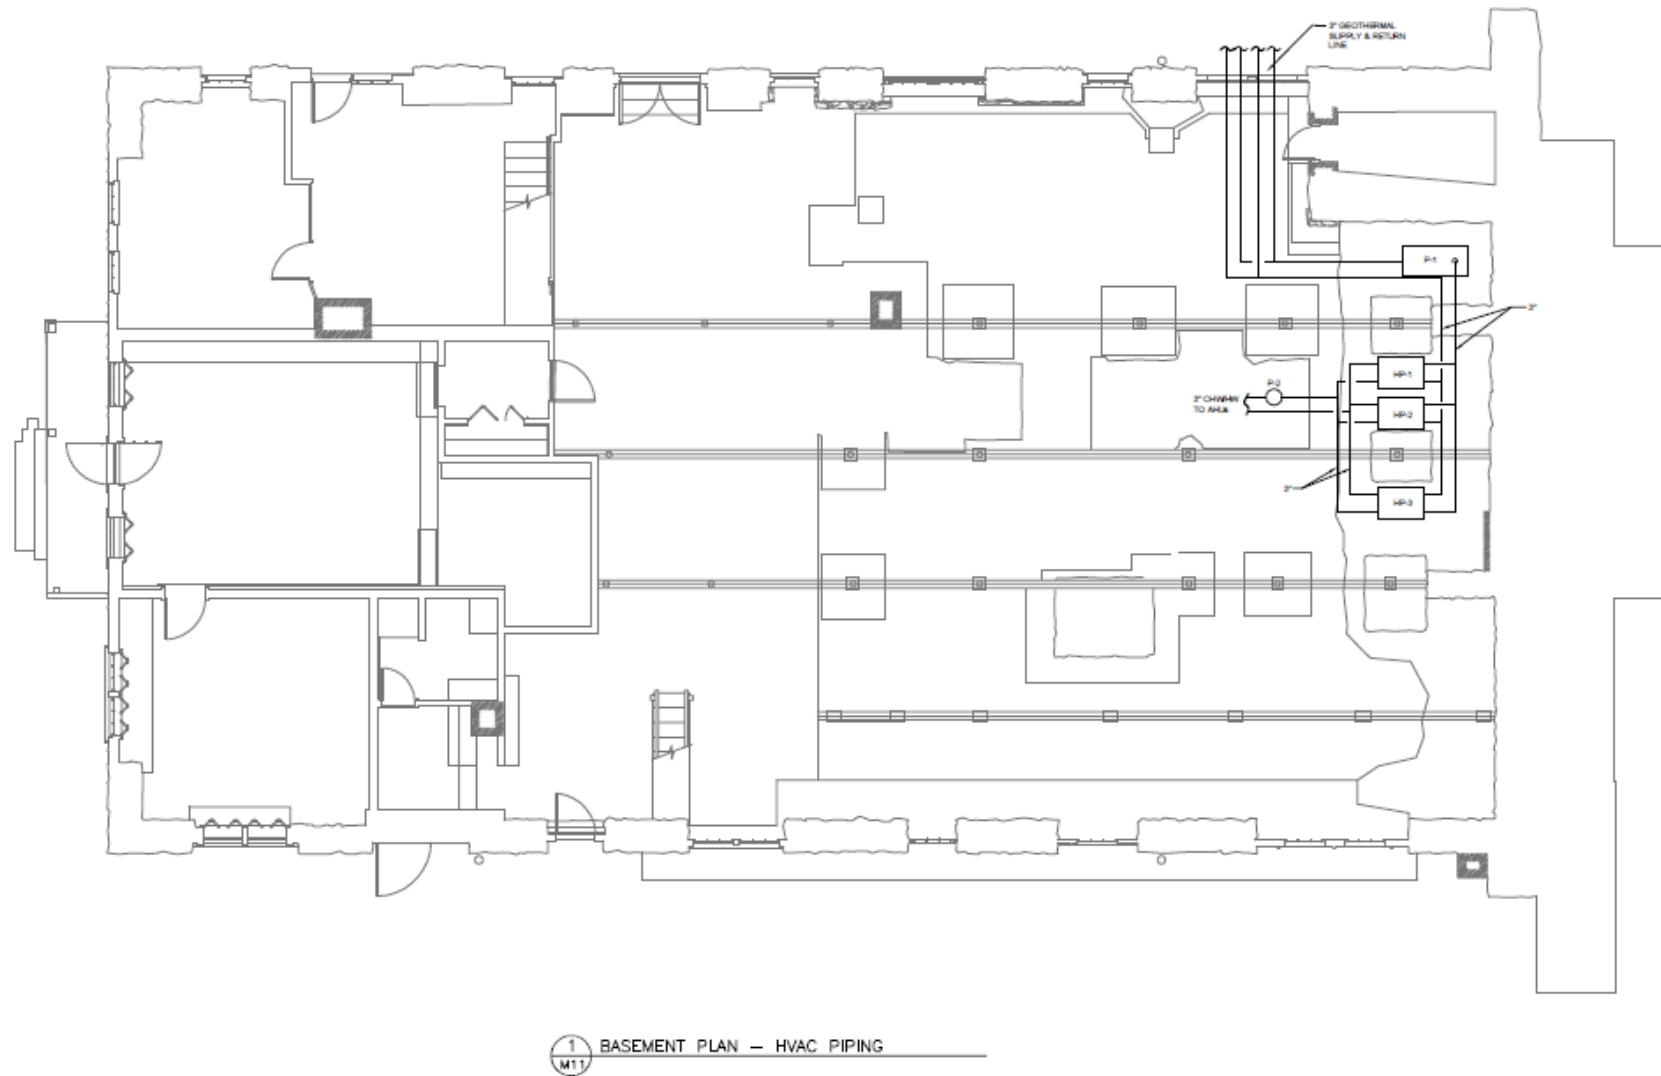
BASEMENT PLAN (HVAC PIPING) FOR CLIMATE CONTROL SYSTEM
